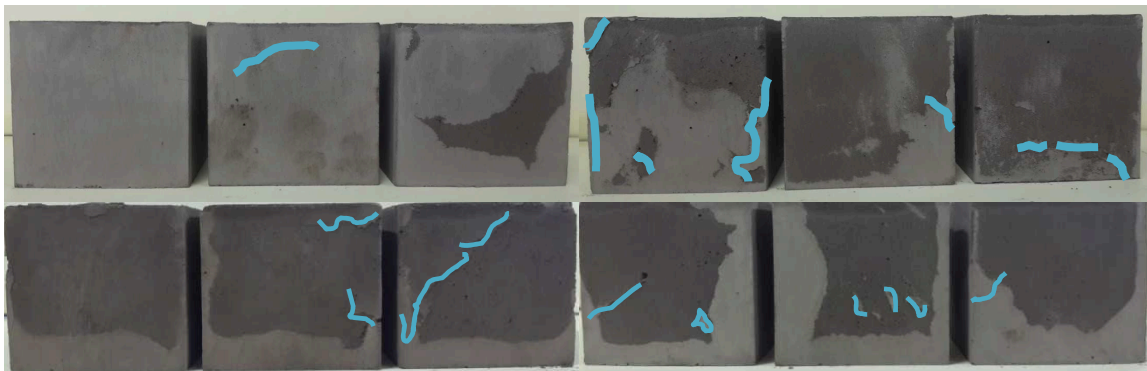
Crack Appearance on the Surface of Cement Paste Containing Fly Ash type C
